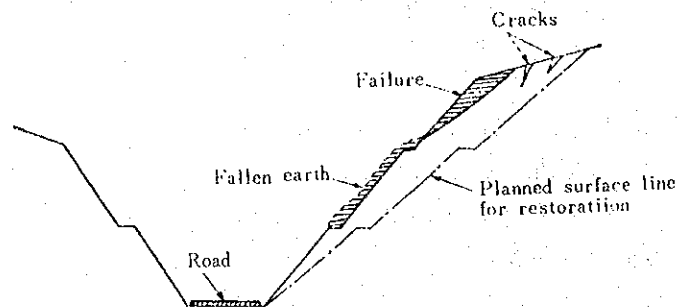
An Example of Restoration after Cracks and Failure
